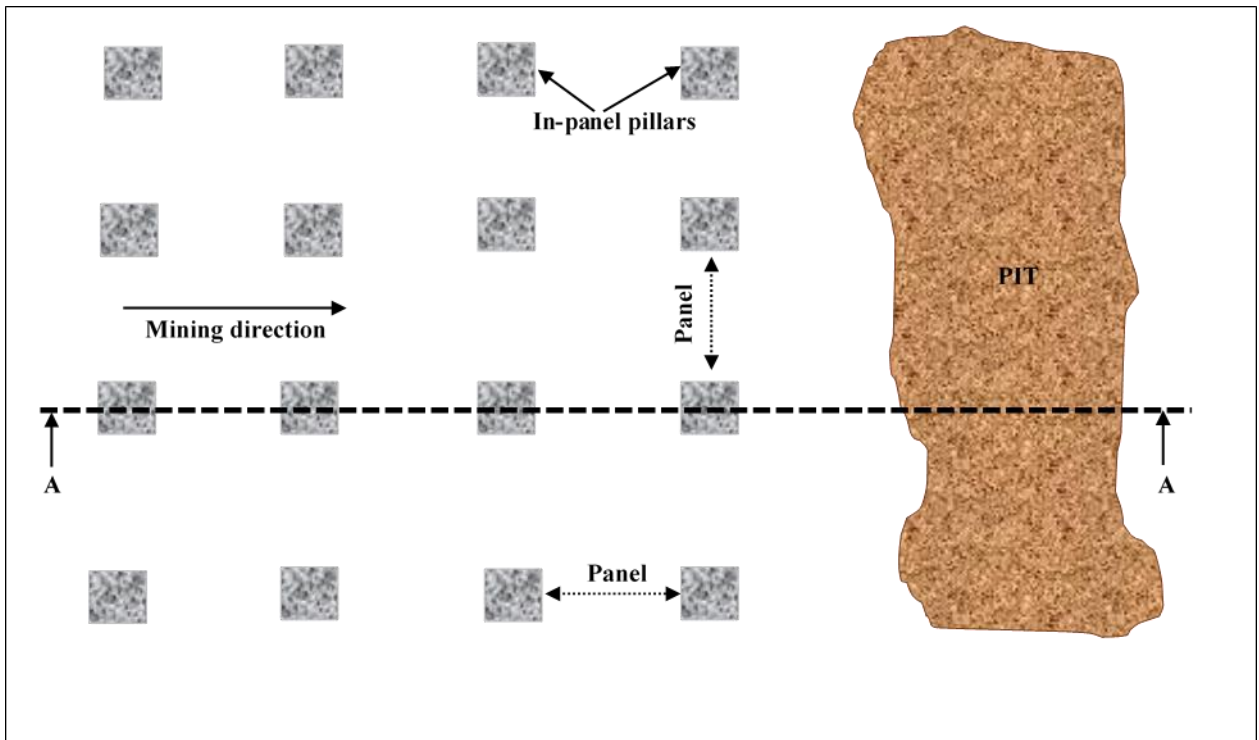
Schematic plan view of the underground excavations interacting with the pit
